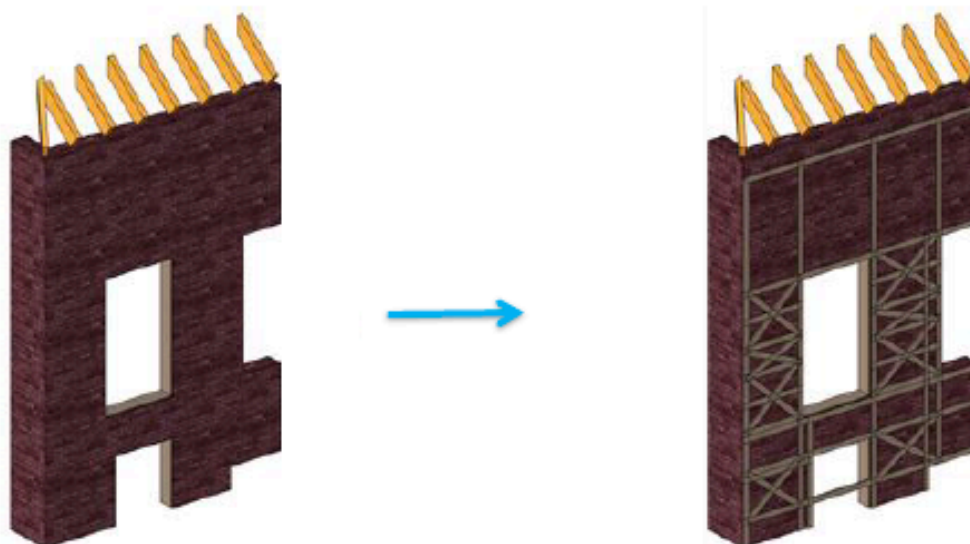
Addition of material to increase strength of masonry wall piers/spandrels.
